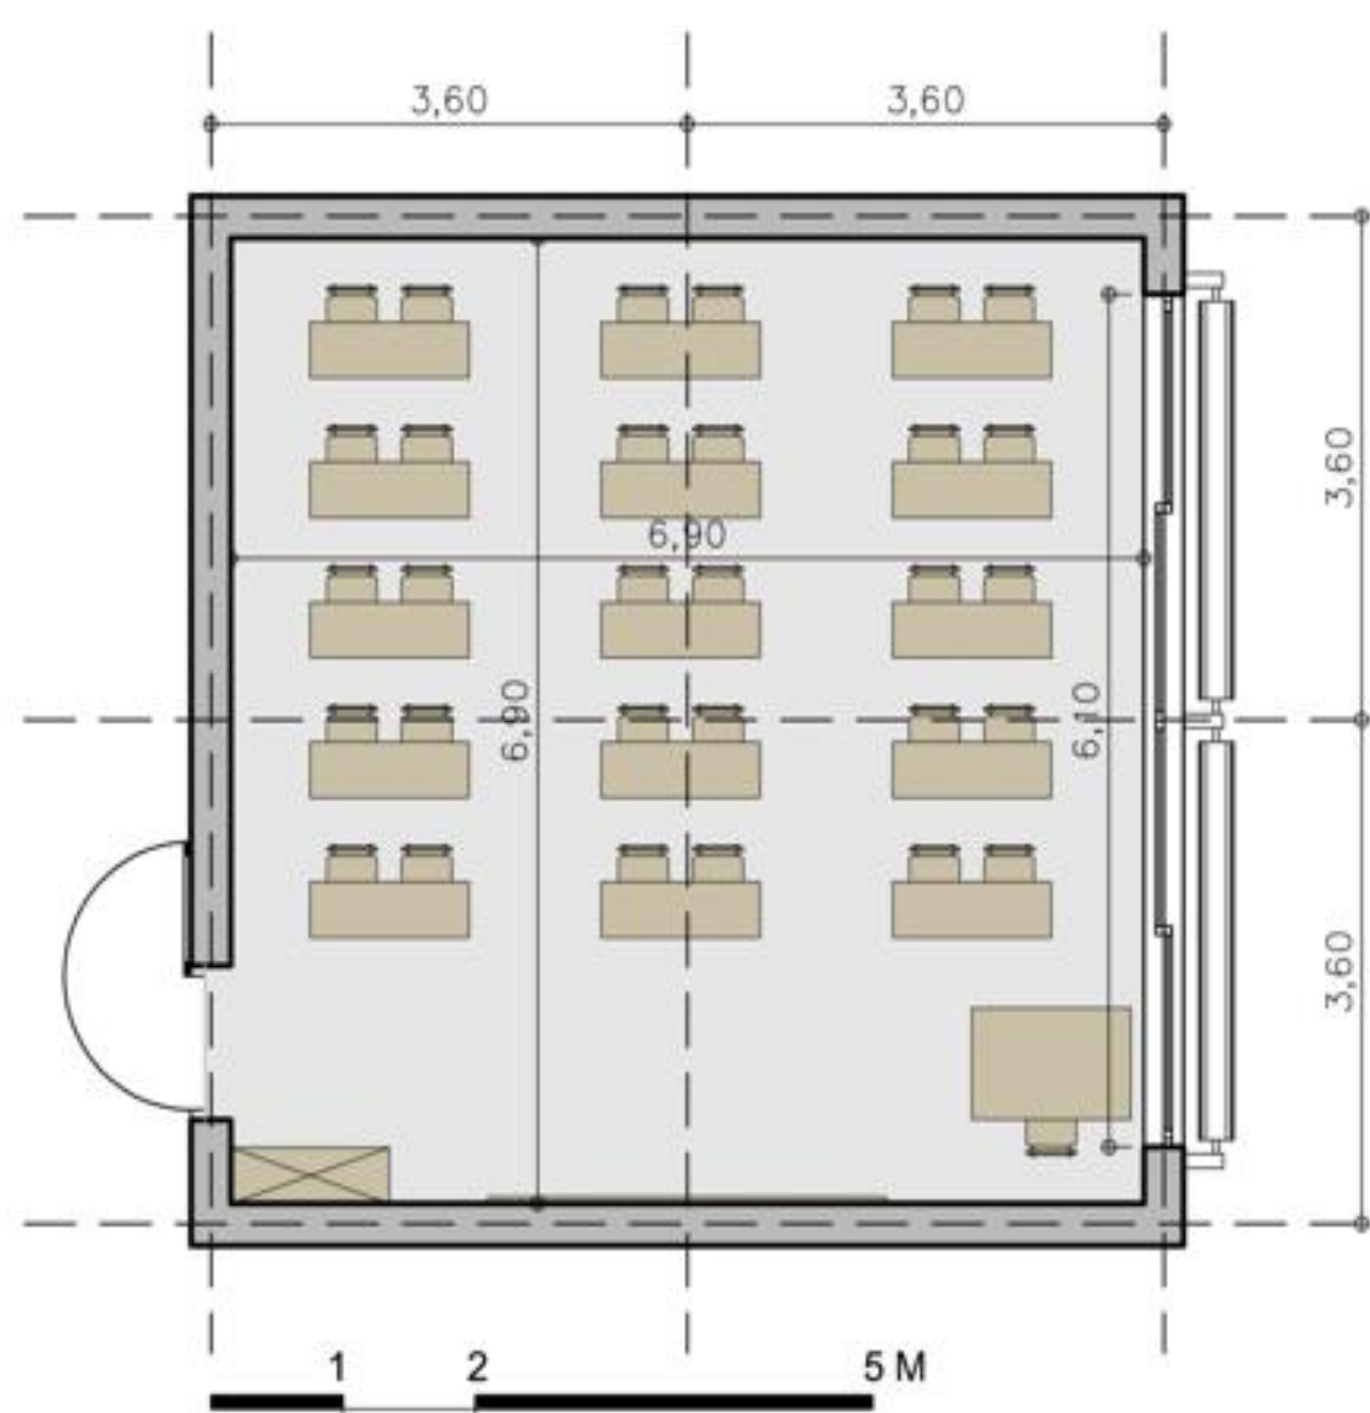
Plan of a typical classroom in Greek public school buildings (Height: 3,2m) [1-3]
